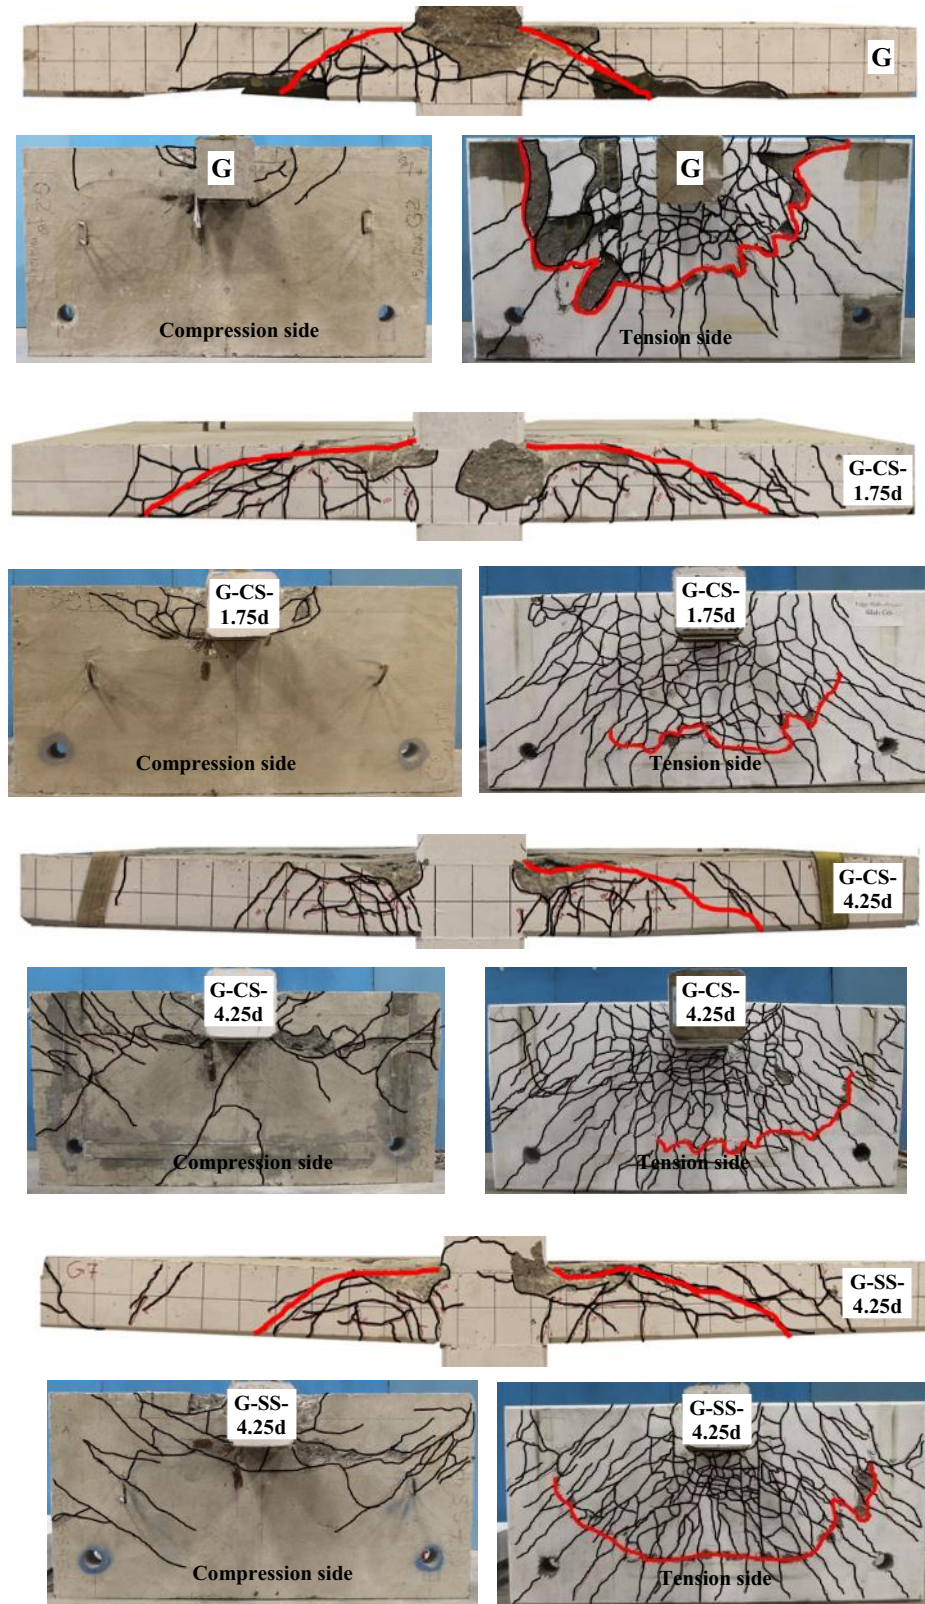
Cracking patterns and punching-shear failure surface for the tested specimens
